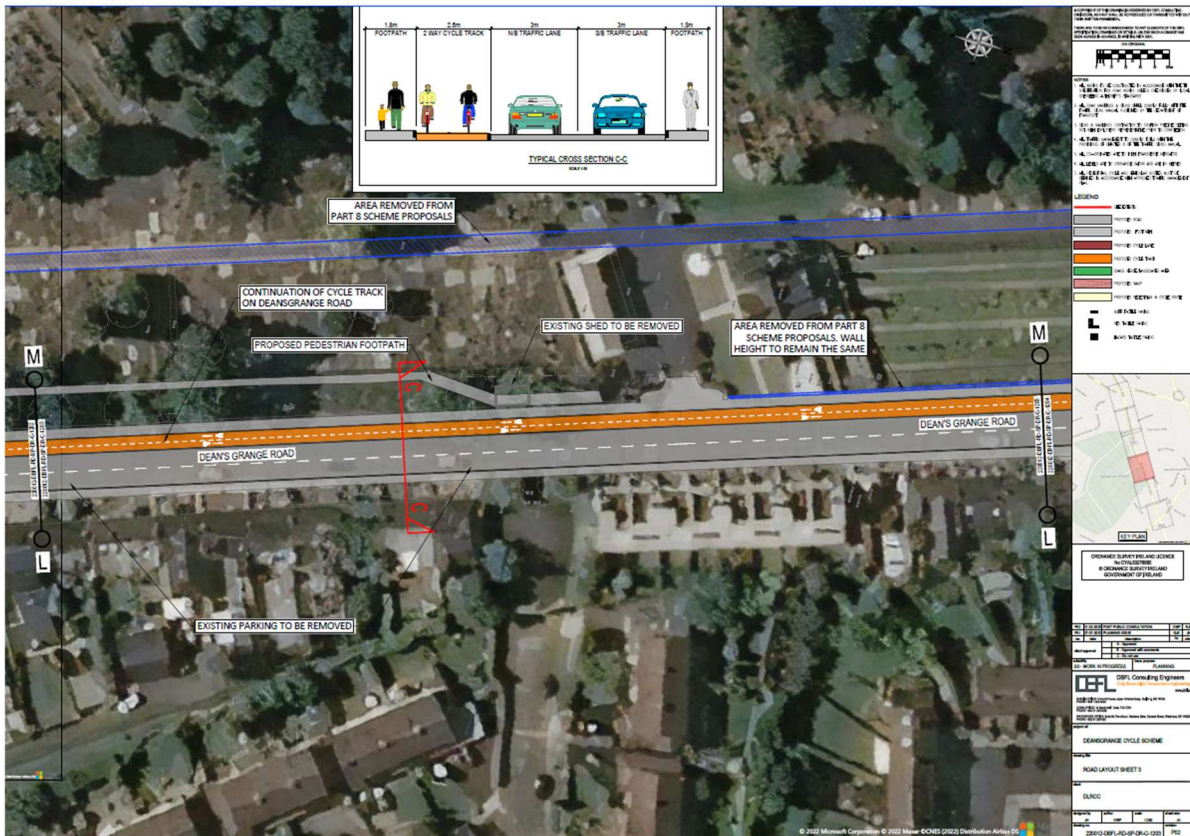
Outline design and layout of proposed scheme- Section 3 (source: DBFL Consulting Engineers)
